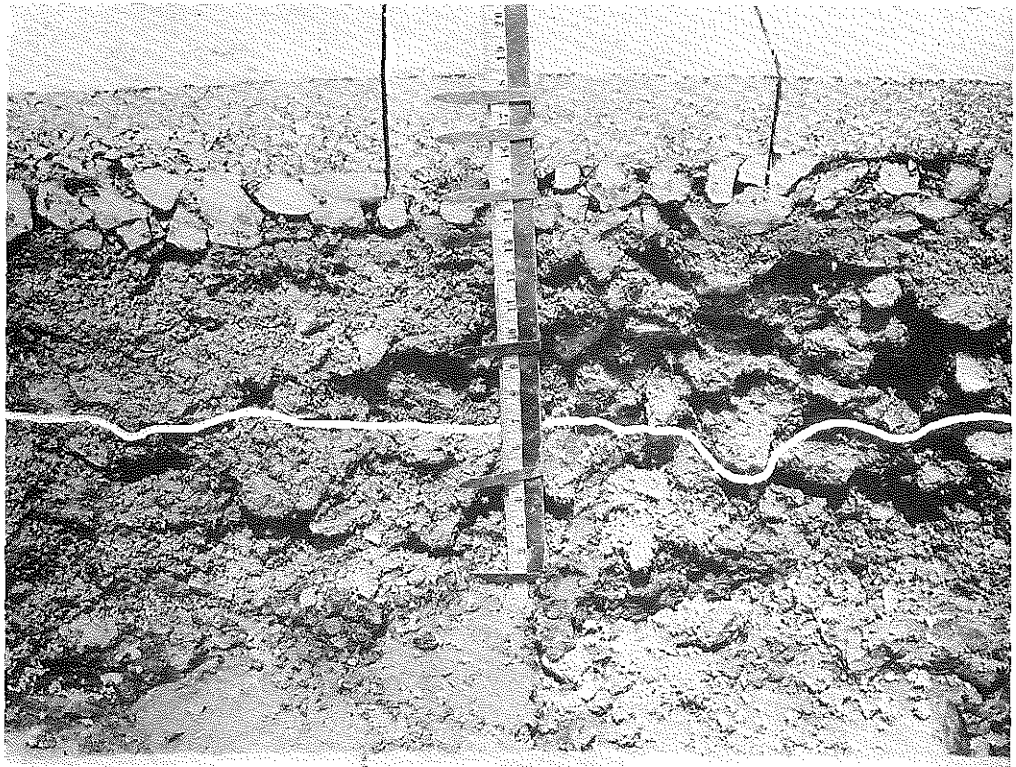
Photograph Showing Exposed Cross Section of a Rutted Pavement. Markers indicate the thickness of pavement layers. Demarcation line shows the height to which subgrade soil had intruded into the WBM base.
